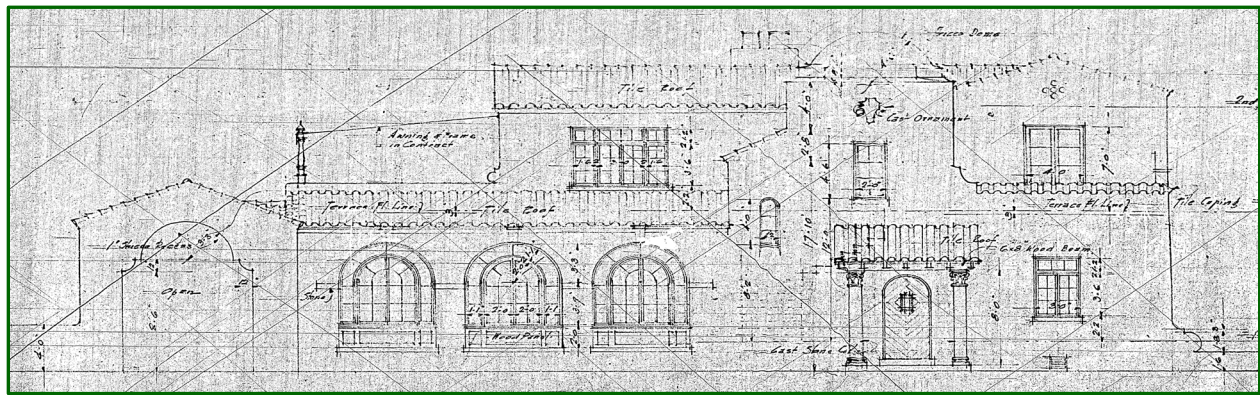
Front (East) Façade, Permit #1160 Drawing, Architect Martin L. Hampton, March 1925
